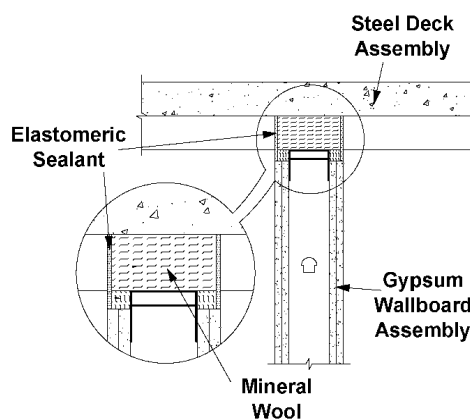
HEAD-OF-WALL JOINT - GYPSUM WALLBOARD WALL CUT TO FIT CONTOURS OF STEEL DECK
